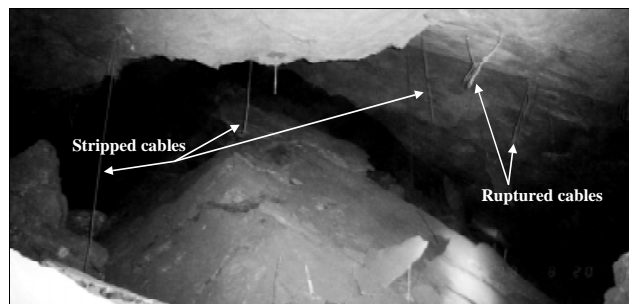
Photograph looking northwards in the test stope, showing the clear structural control on the back failure, as well as cable failures.
